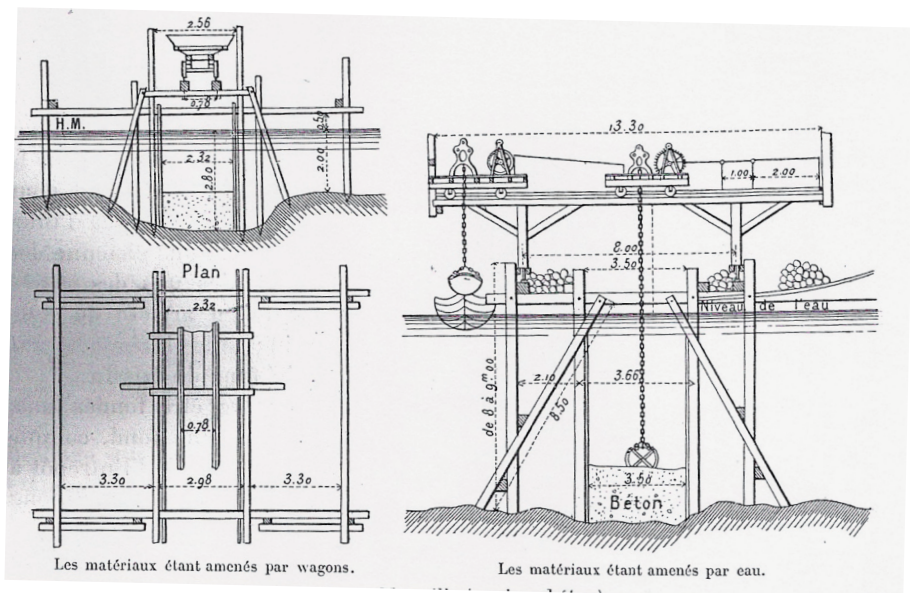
Placing concrete under water around 1890 [Rochemont and Desprez 1900]
